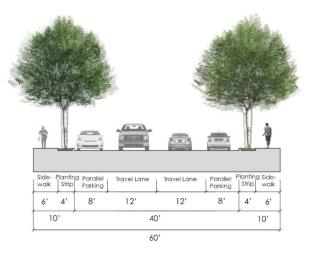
North Pioneer Street details as adopted in the Lowell Downtown Master Plan.
